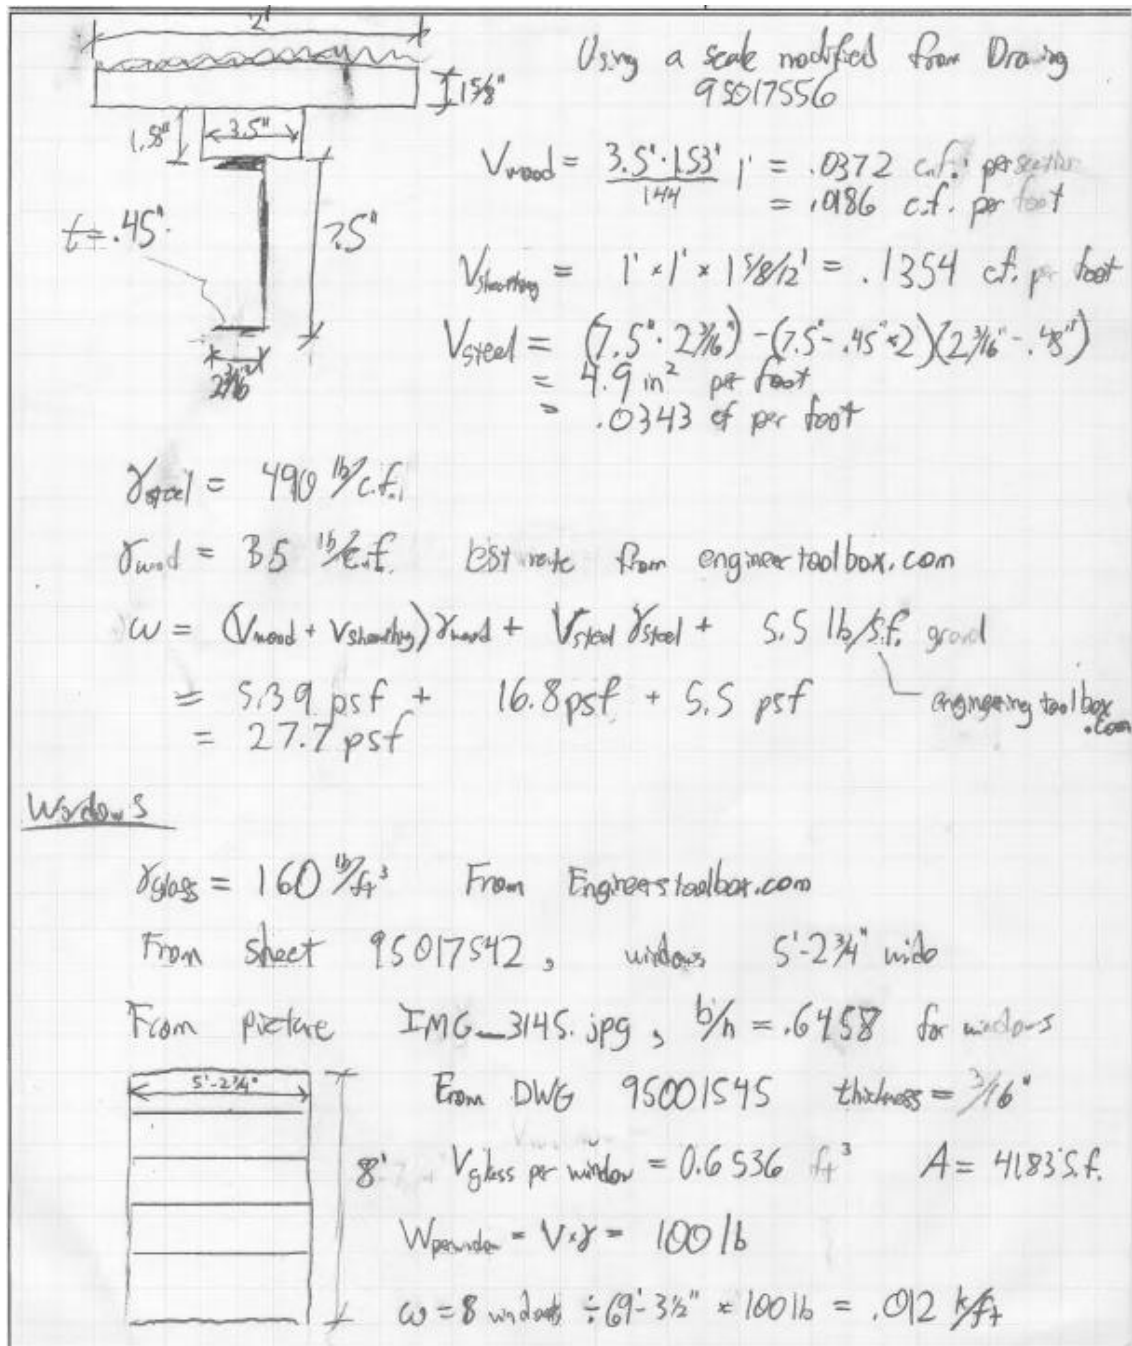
Calculations for roof and wall loads – roof density and window layout
